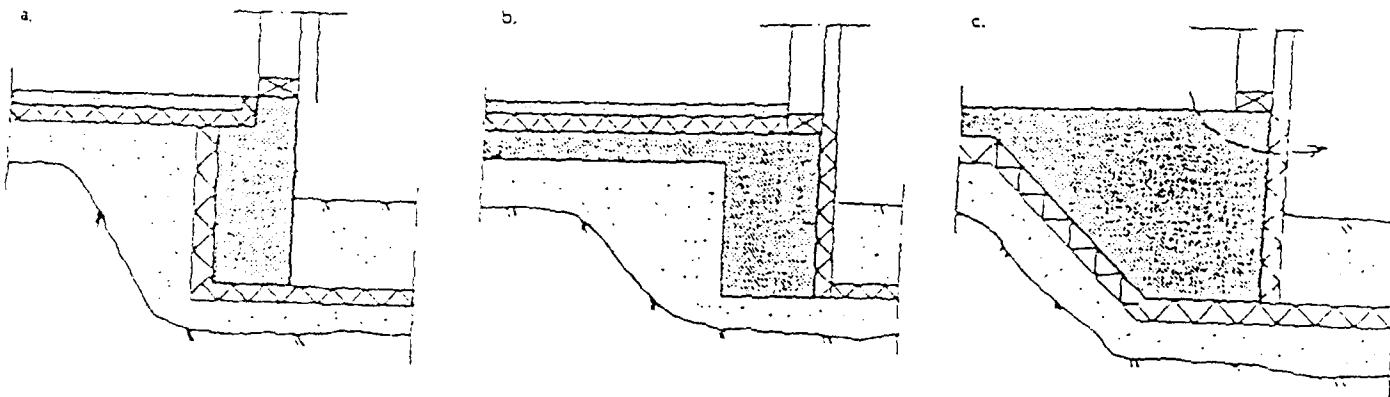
These designs for heated or cold buildings are satisfactory with regard to frost penetration requirement but design c. is unsuitable for heated buildings without vertical insulation of the foundation wall.
